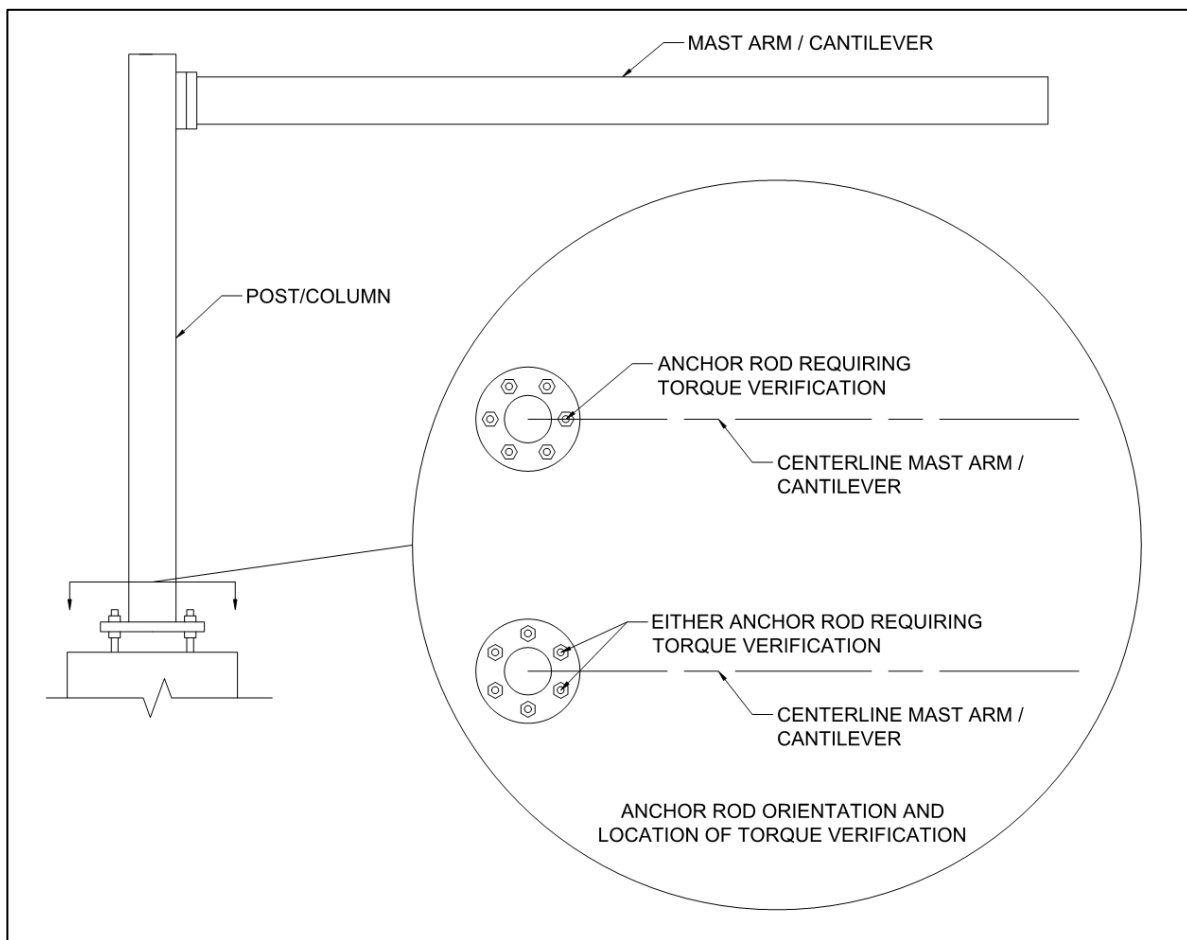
Varying Anchor Rod Orientations and Required Location of Torque Verification for Mast Arm / Cantilevered Structures.
